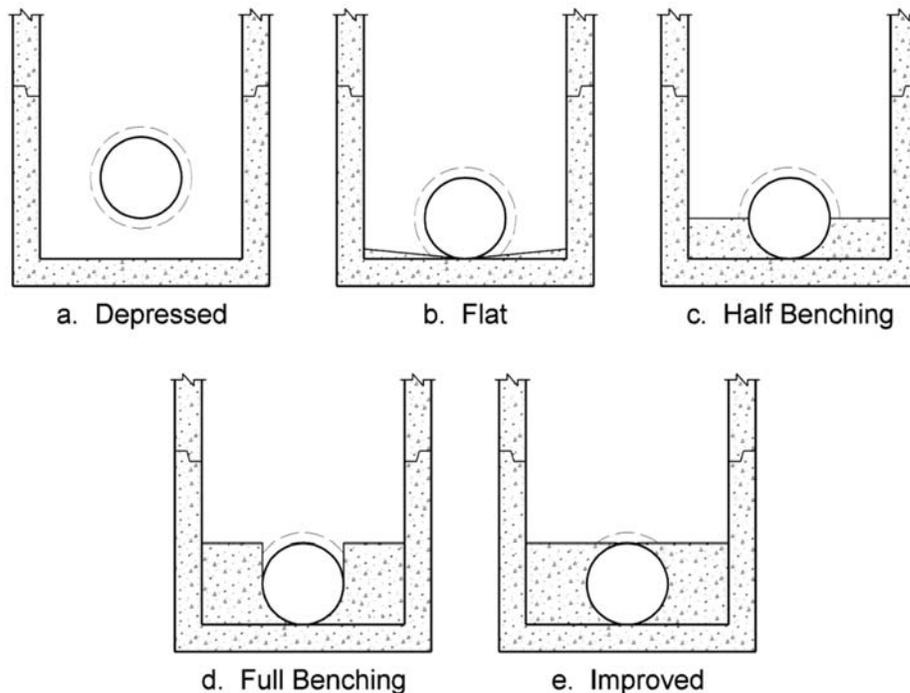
C - Manhole benching methods (Source FHWA HEC-22, 3rd Edition)
